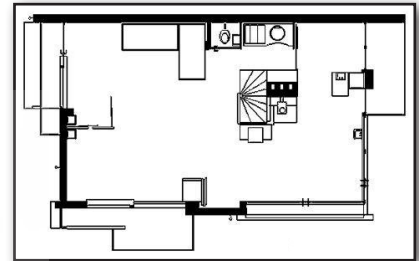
First Plan of the Schroder House, Architect: Gerrit Rietveld, 1924, in Utrecht, Netherlands. Source: www.great buildings.com
